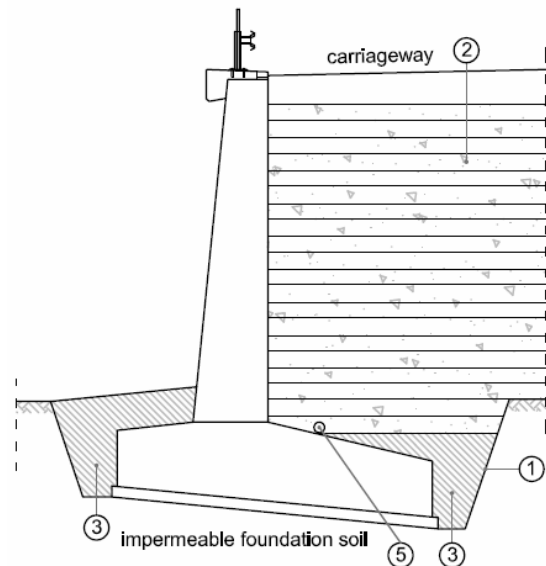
Connection of a fill made of non-cohesive material to the supporting wall (1 excavation, 2 backfill of non-cohesive material, 3 cohesive impermeable material, 5 drainage pipe)
